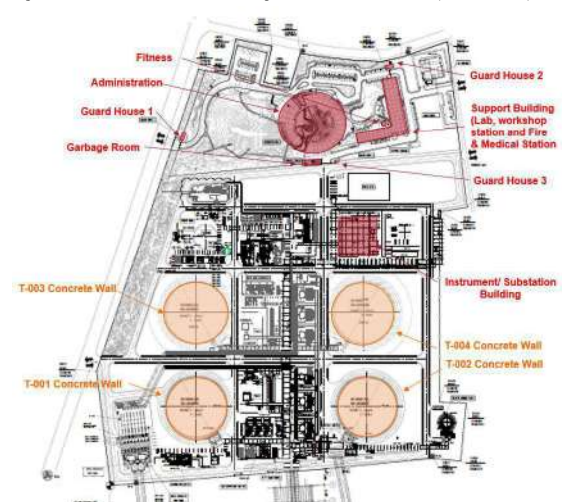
Overall View of Plant Buildings and Structures for BRA (Berth Area)
